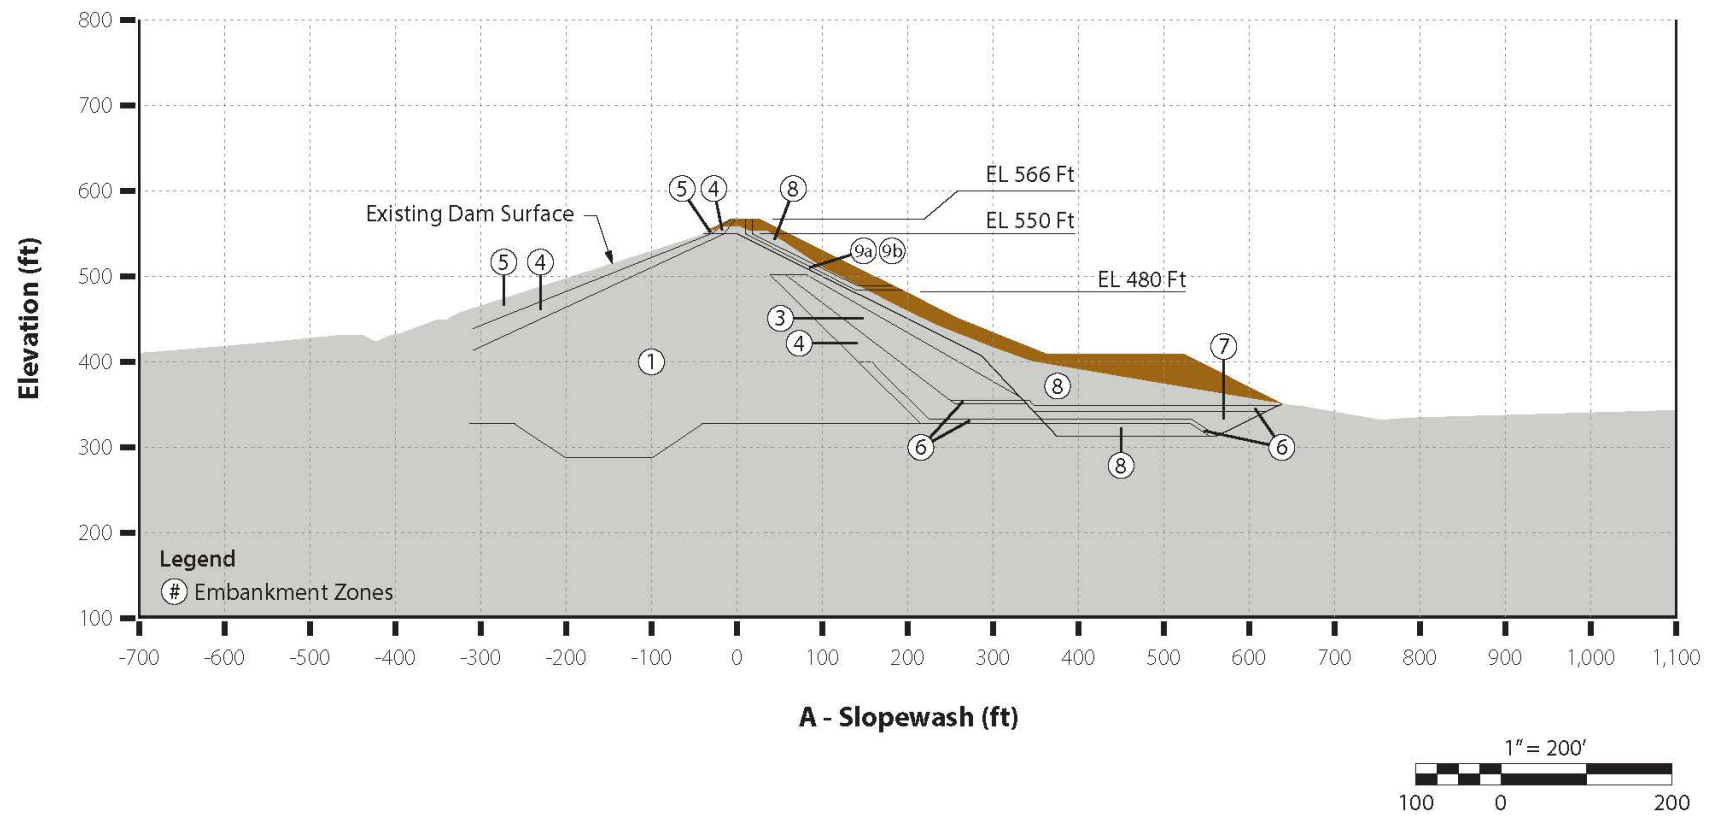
Dam Raise Typical Cross Section, Embankment Materials, and Zones
